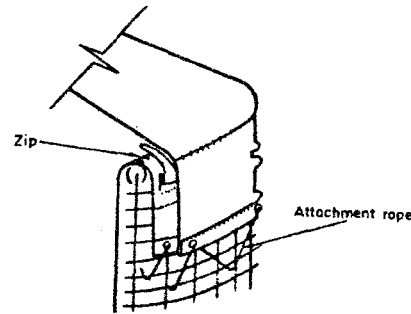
Method of securing roof-cone to floor-wall unit and weld-mesh walls in silos.
